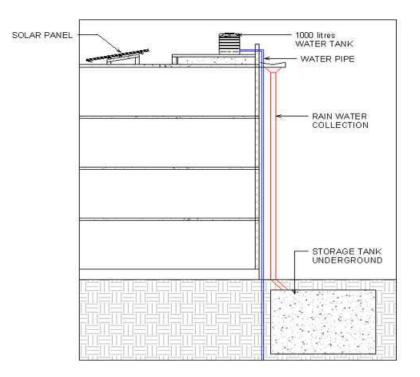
Sectional elevation showing rain water harvesting system (SketchUp Pro 2020)
